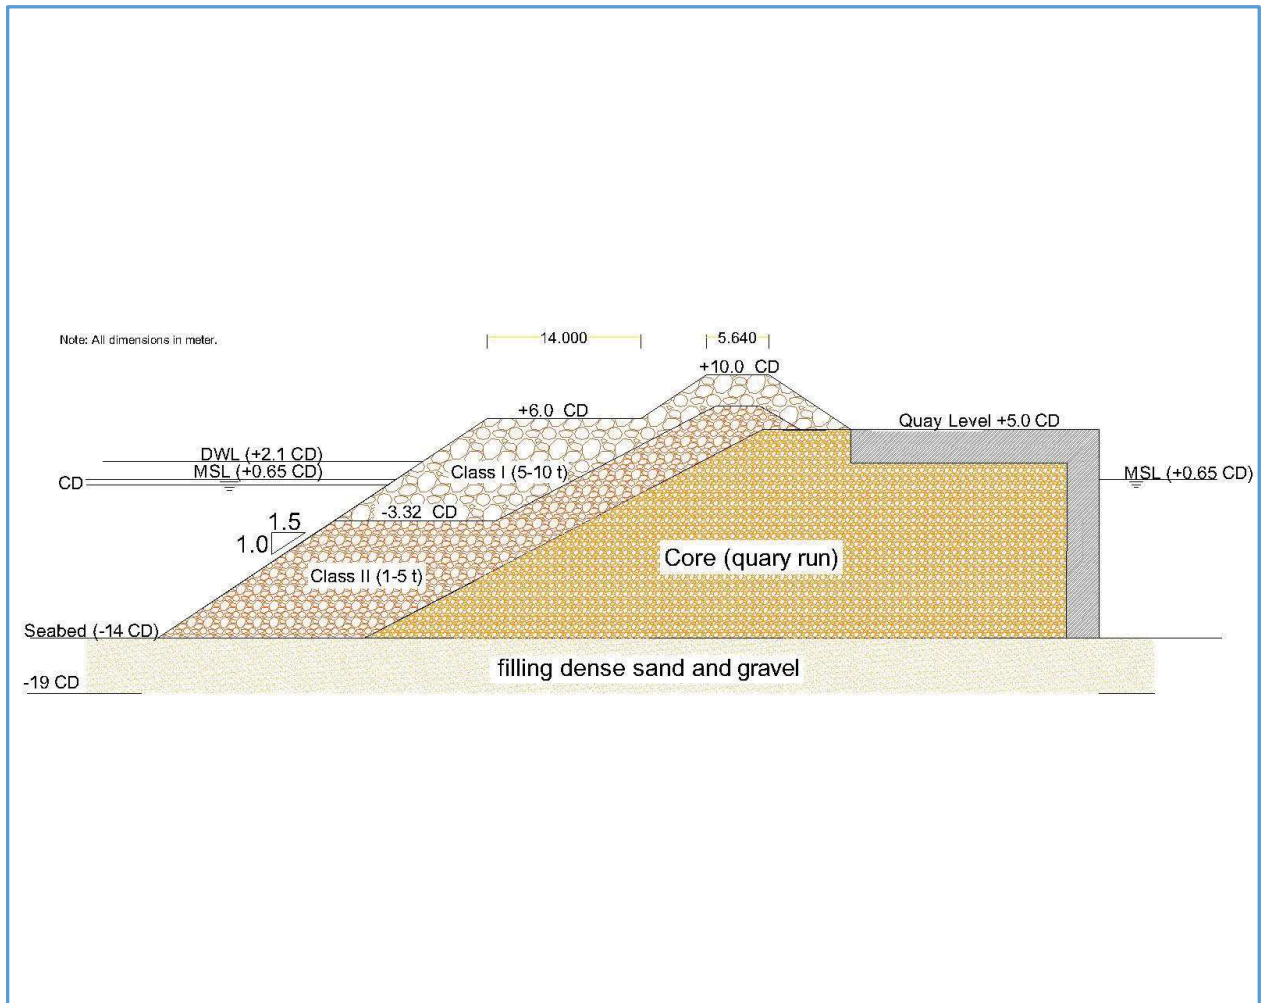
Final cross-section of the structure for the designed berm breakwater.
